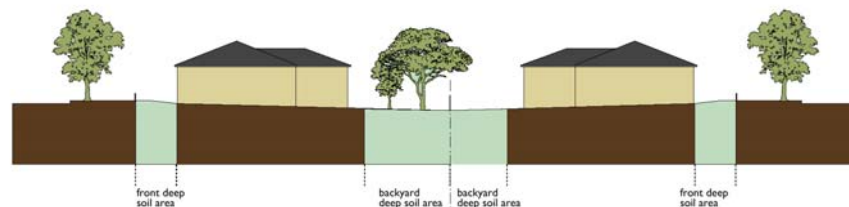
Deep soil areas are free of structures. They fit neatly around the building without obstruction of either above or below ground built elements such as outbuildings, driveways, impervious surfaces, basement garages, detention tanks or paved terraces.
